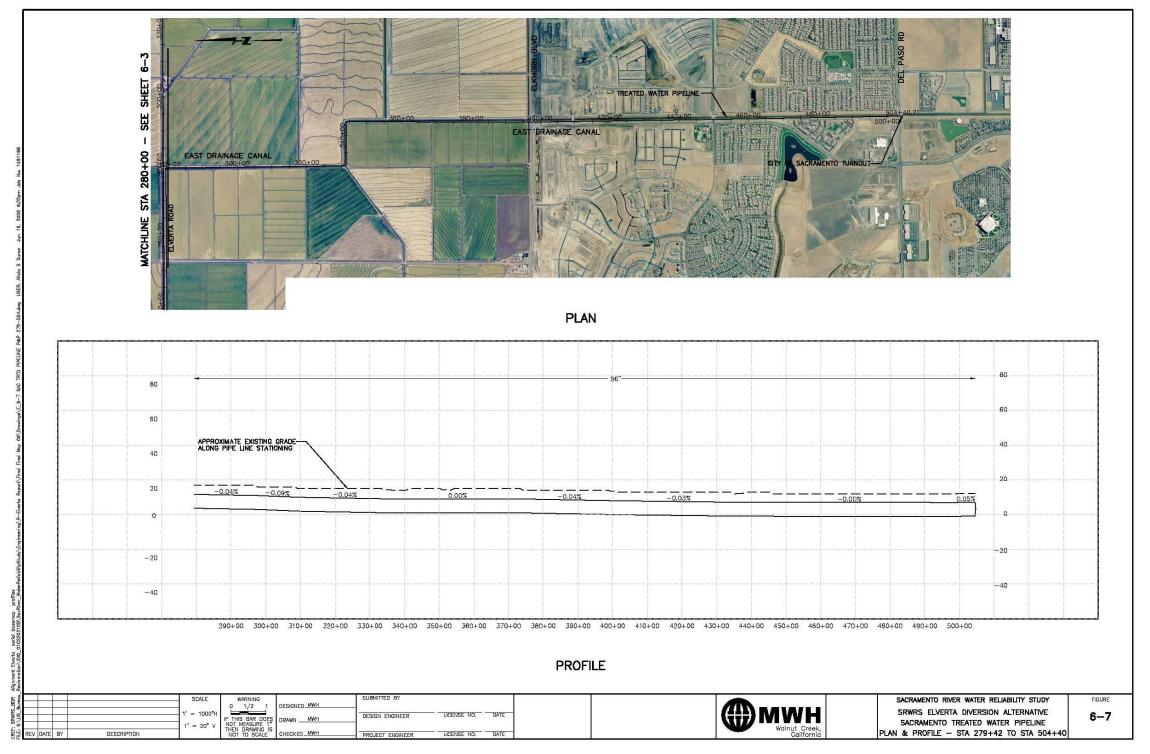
SRWRS Elverta Diversion Alternative Sacramento Treated Water Pipeline Plan and Profile – STA 279 to STA 504+40
